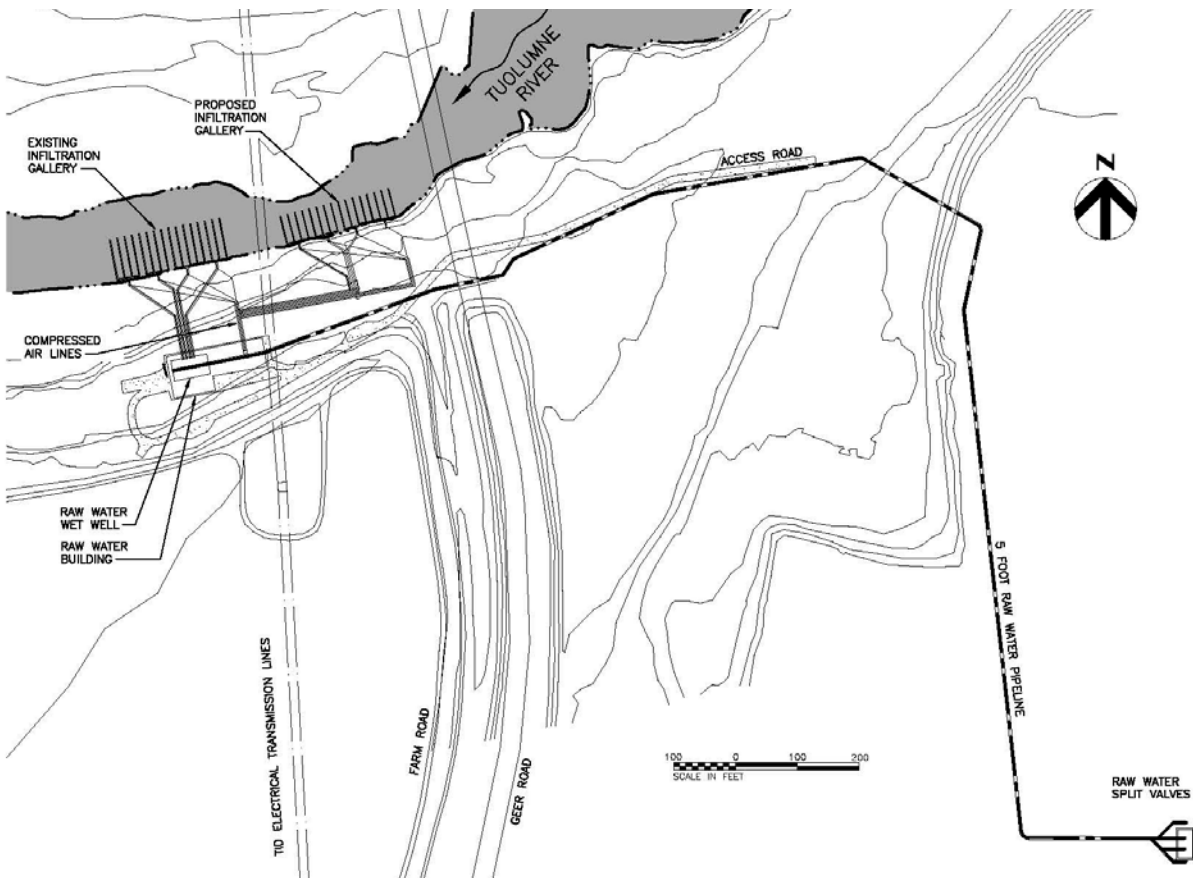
Location of IG-1 and IG-2 just downstream of the Geer Road Bridge. Pipeline right-of-way leading to TID's Ceres Canal. FERC Project Boundary would extend to the raw water splitter valve.
